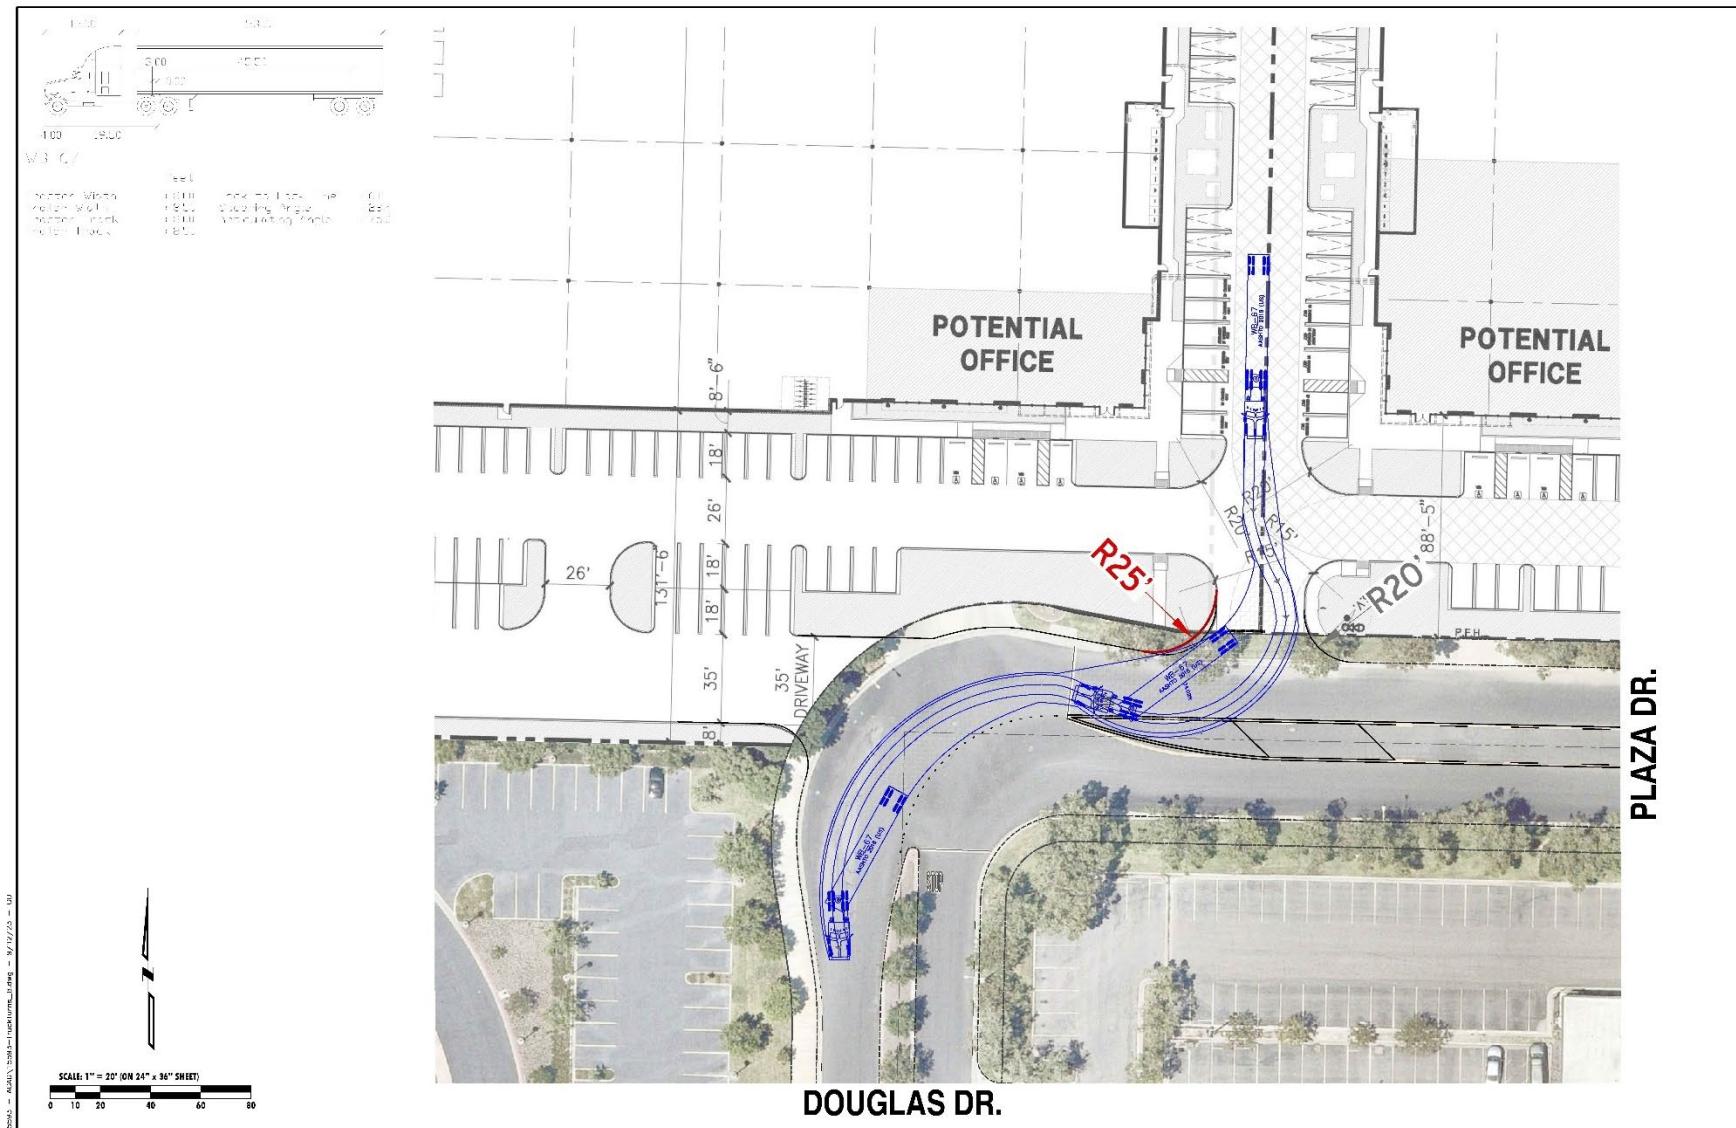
INBOUND ON-SITE TRUCK CIRCULATION VIA DRIVEWAY 2
